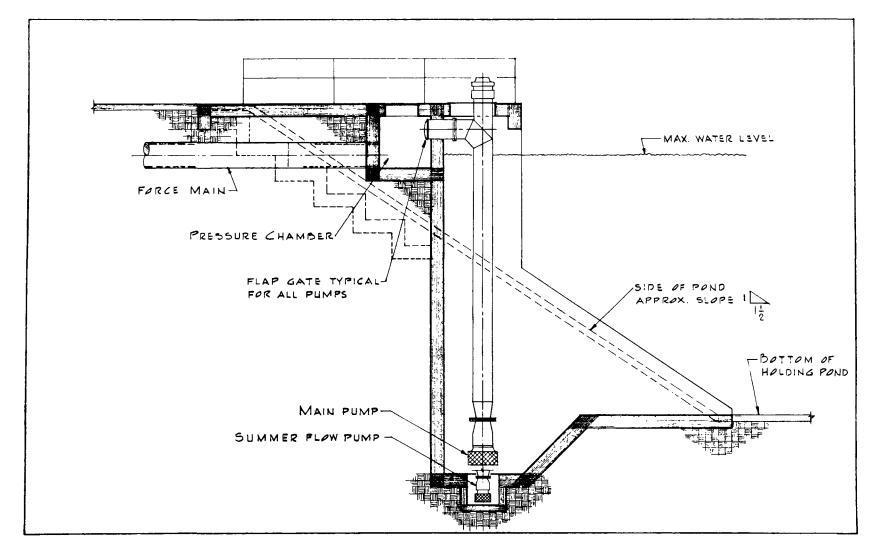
SECTION OF TYPICAL PUMP STATION FOR RESERVOIR WITHDRAWAL
